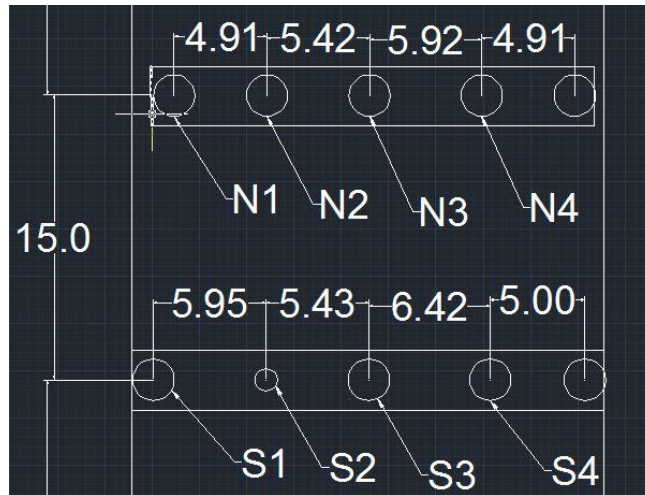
Plan View of Grant County Bridge Piles (with dimensions)
